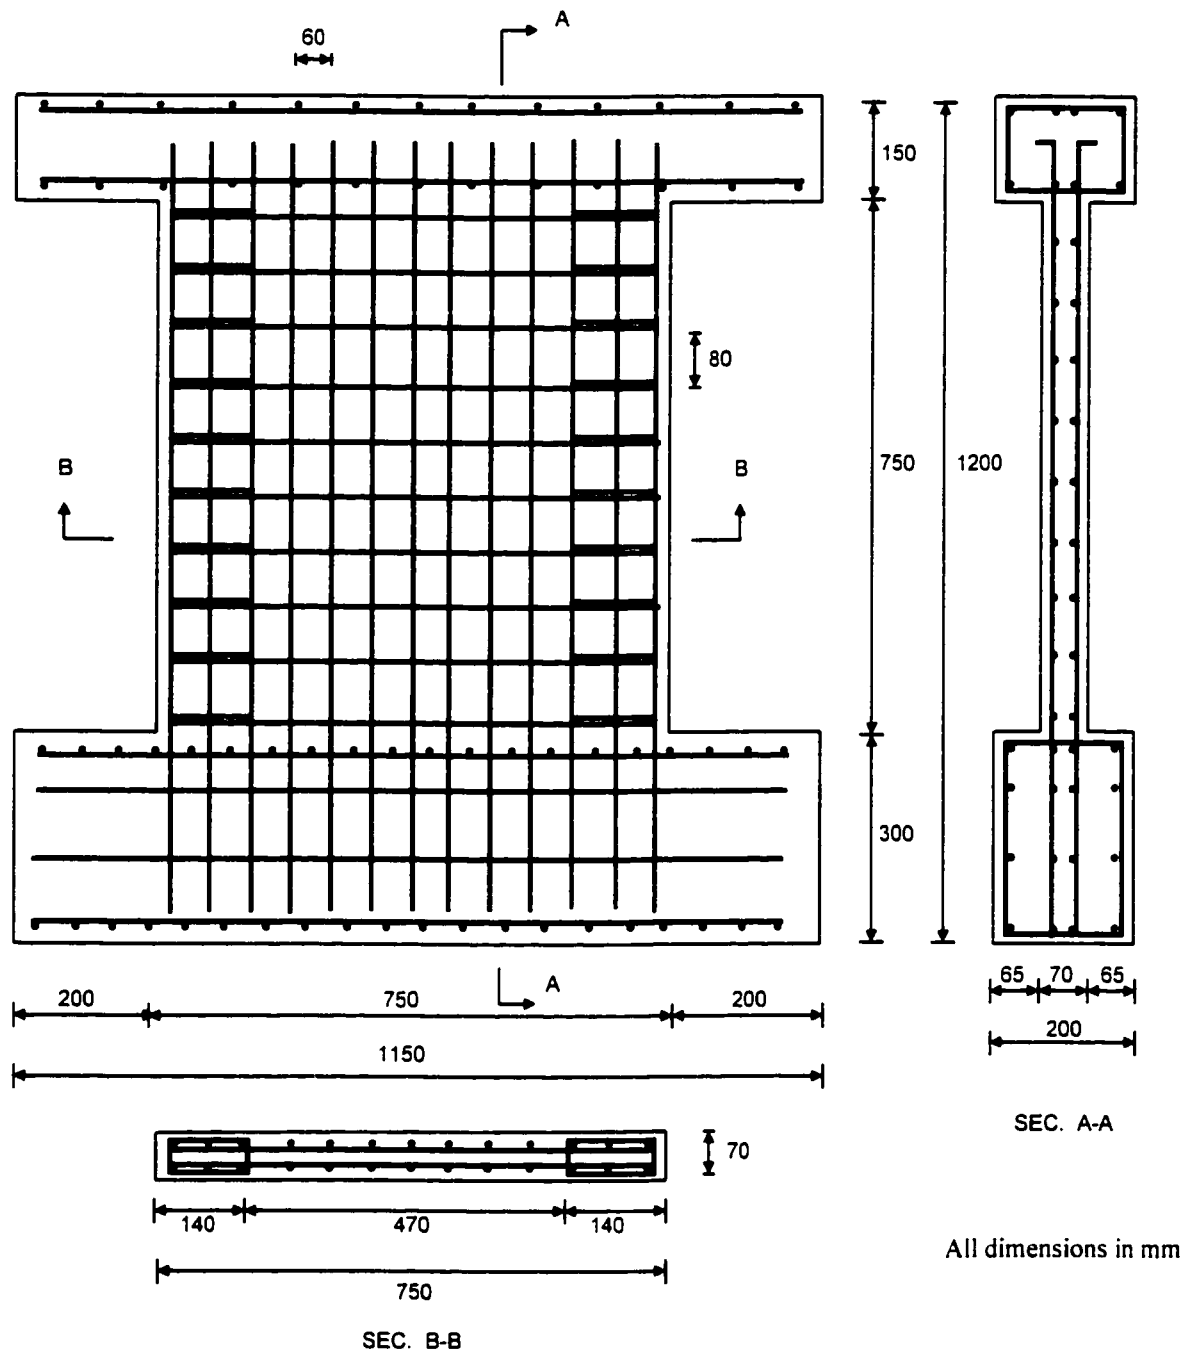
Geometry and reinforcement details of shear walls SW14, SW15, and SW16 tested by Lefas et al [23]
